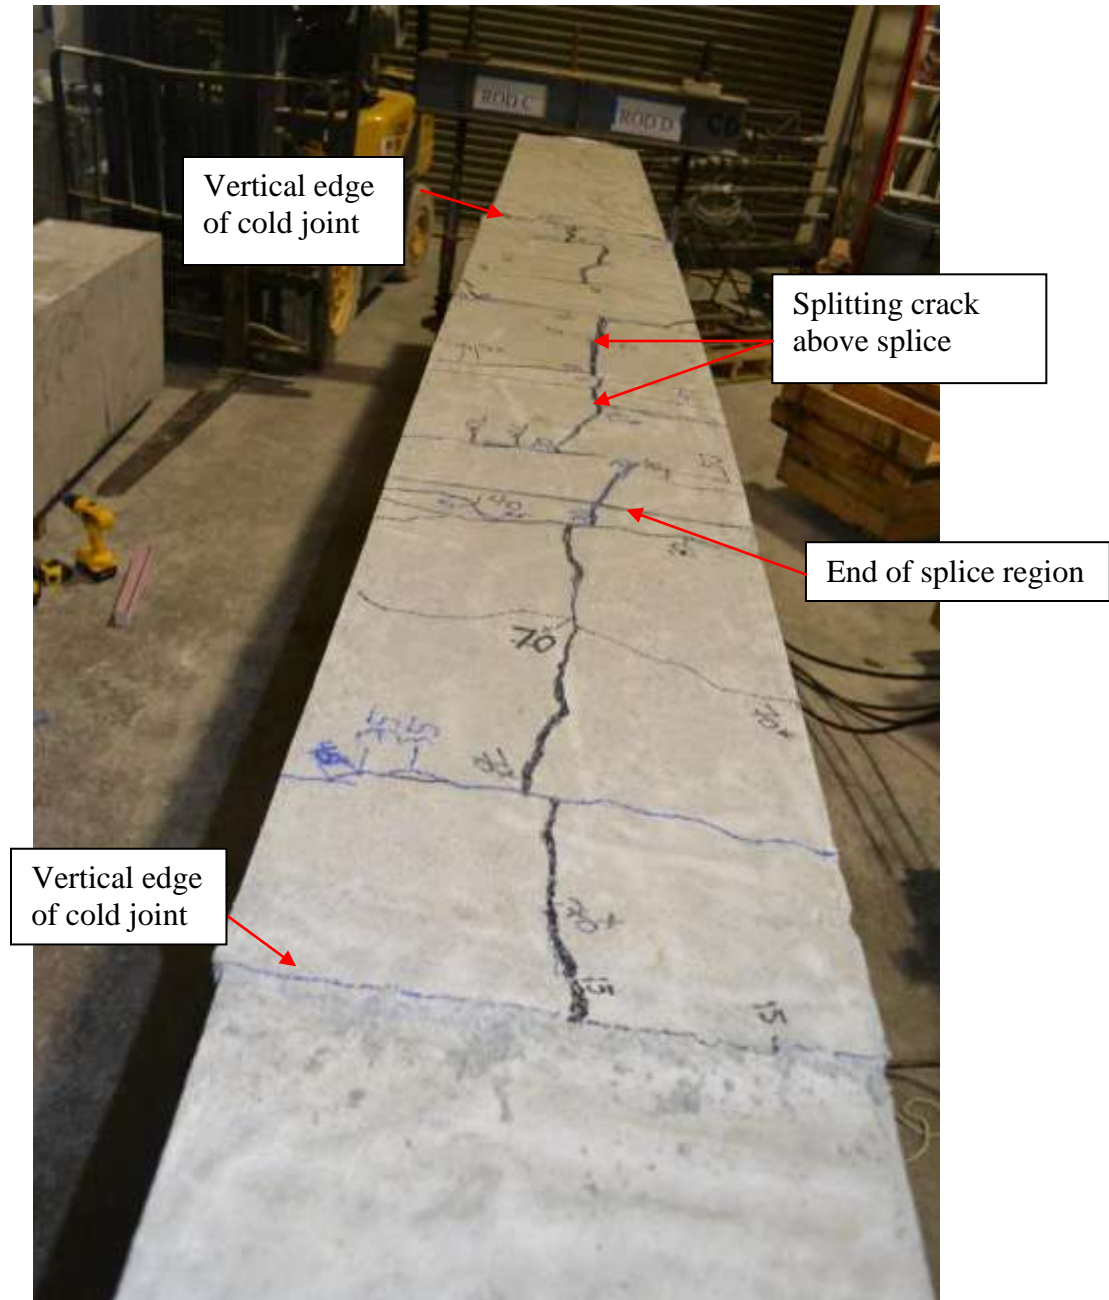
Splitting crack at the top of the splice region for Beam A1 (33-in. splice length).
